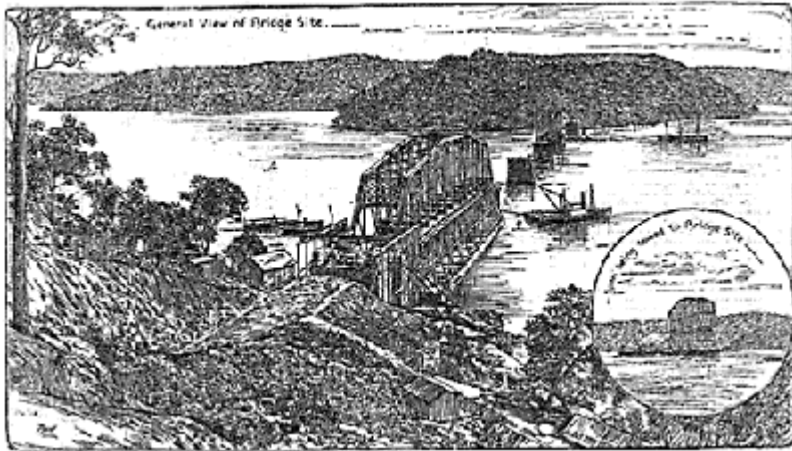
Span No. 1 being towed to its position (in the inset) and on abutment and Pier No. 1. span no. 4 in the middle of the Hawkesbury River (Engineering News, 1889a).
